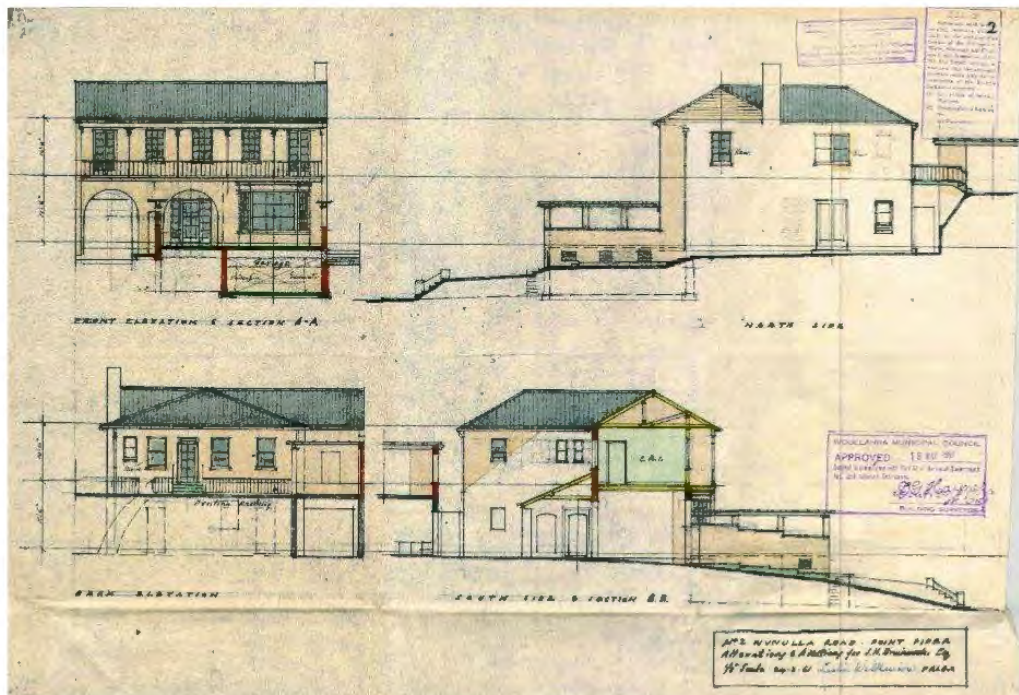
Plans from BA273/1961 for J H Broinowski (Source: Woollahra Records)
